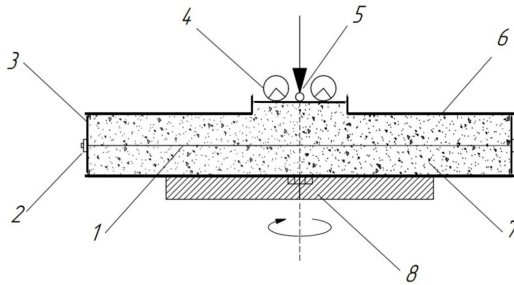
Diagram of Prestressing a Reinforced Concrete Element Using Centrifugal Forces:
